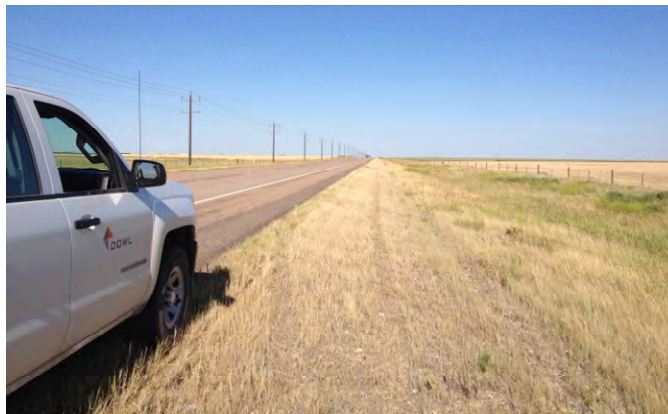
Segment 2, RP 241.4±, looking eastbound.
